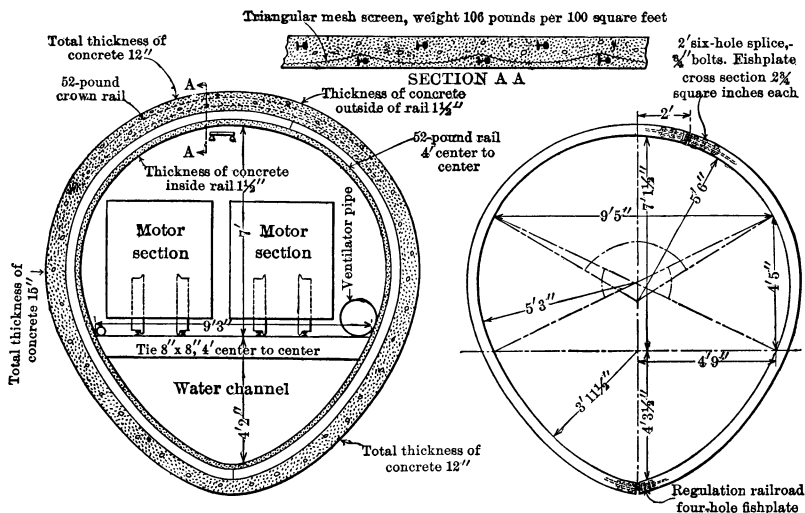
Reinforced concrete lining at Snake Creek Tunnel.
